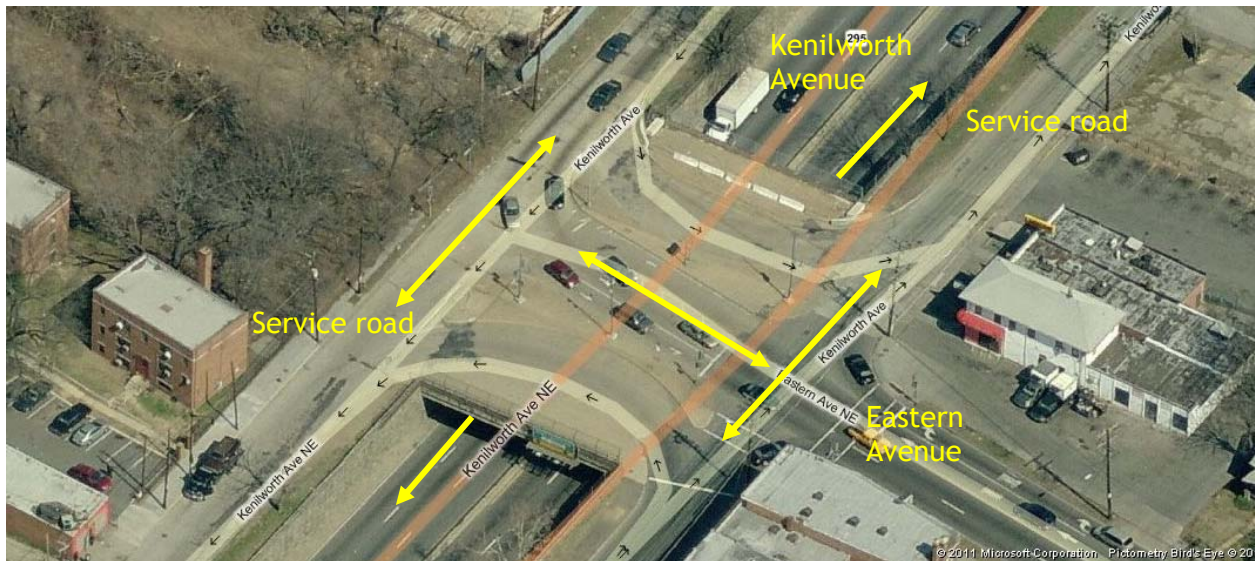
Preconstruction aerial photograph of Eastern Avenue bridge.
